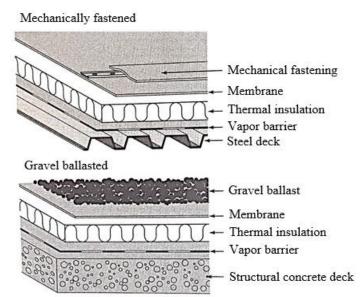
Typical single-ply roofing system (Lyons, 2004)
